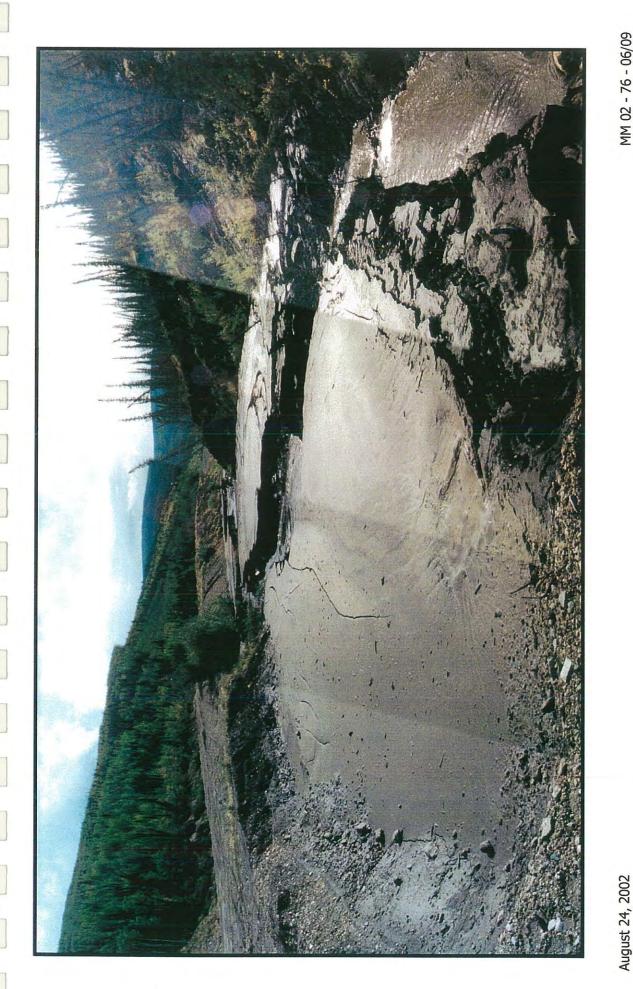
Looking downstream showing the failing left bank valley wall at the Marsden Reclamation Site.
